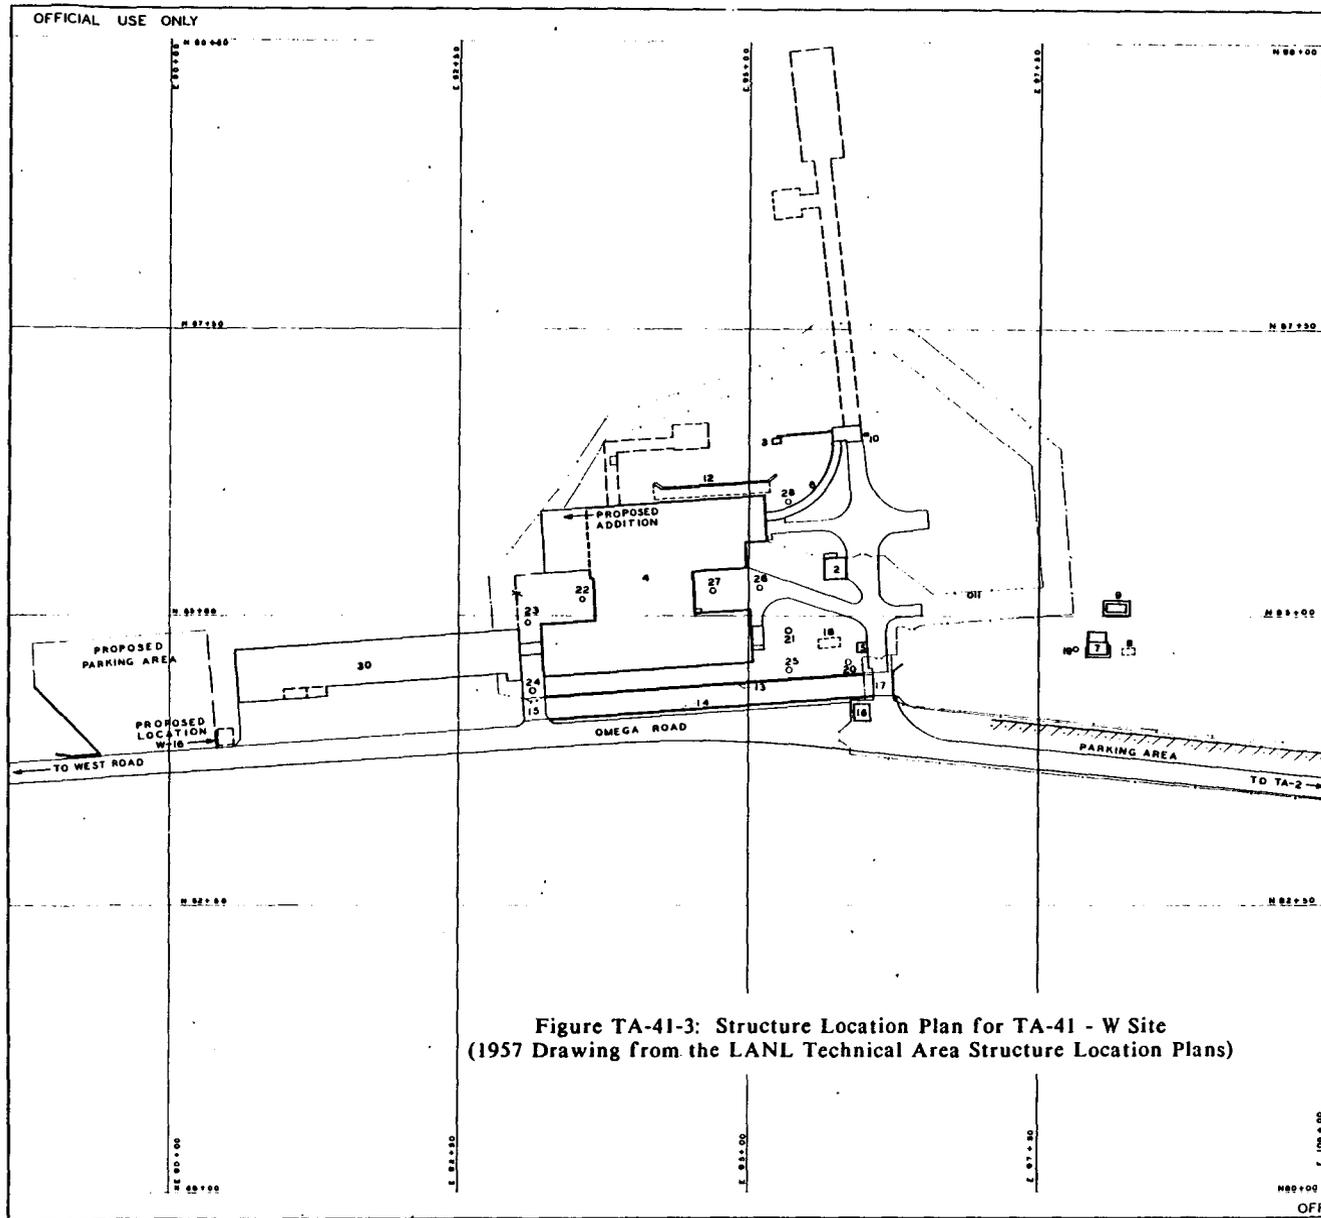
Structure Location Plan for TA-41 - W Site
